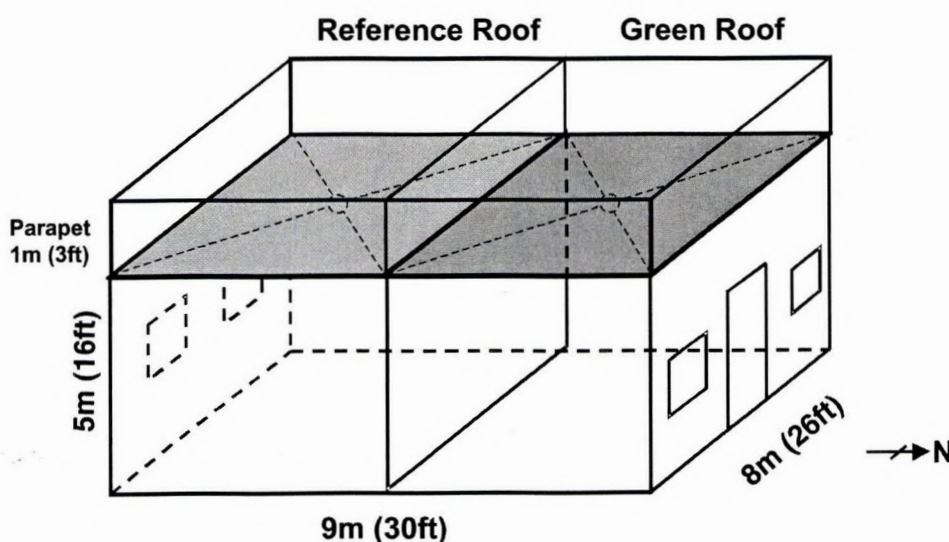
Schematics of the Field Roofing Facility (FRF) at the NRC campus in Ottawa. Each roof section is sloped at 2% to a central drain where the runoff is collected and monitored in the building.
